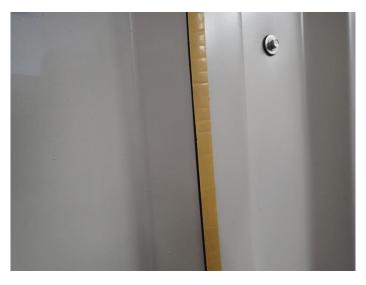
The Noavon 1422 adhesive is applied on the rib of the sandwich panel.
